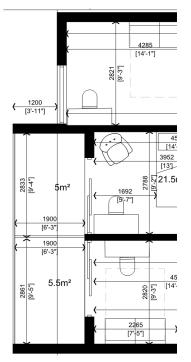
Extract from floor plans indicating the set-back of glazing from the western facade/boundary.
